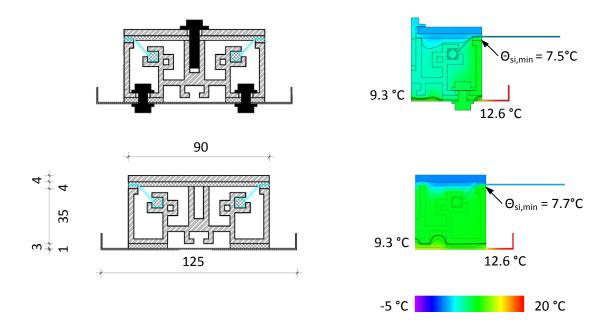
Sectional drawing and temperature field of the reference profile with (*upper picture*) and without (*lower picture*) screw joints
